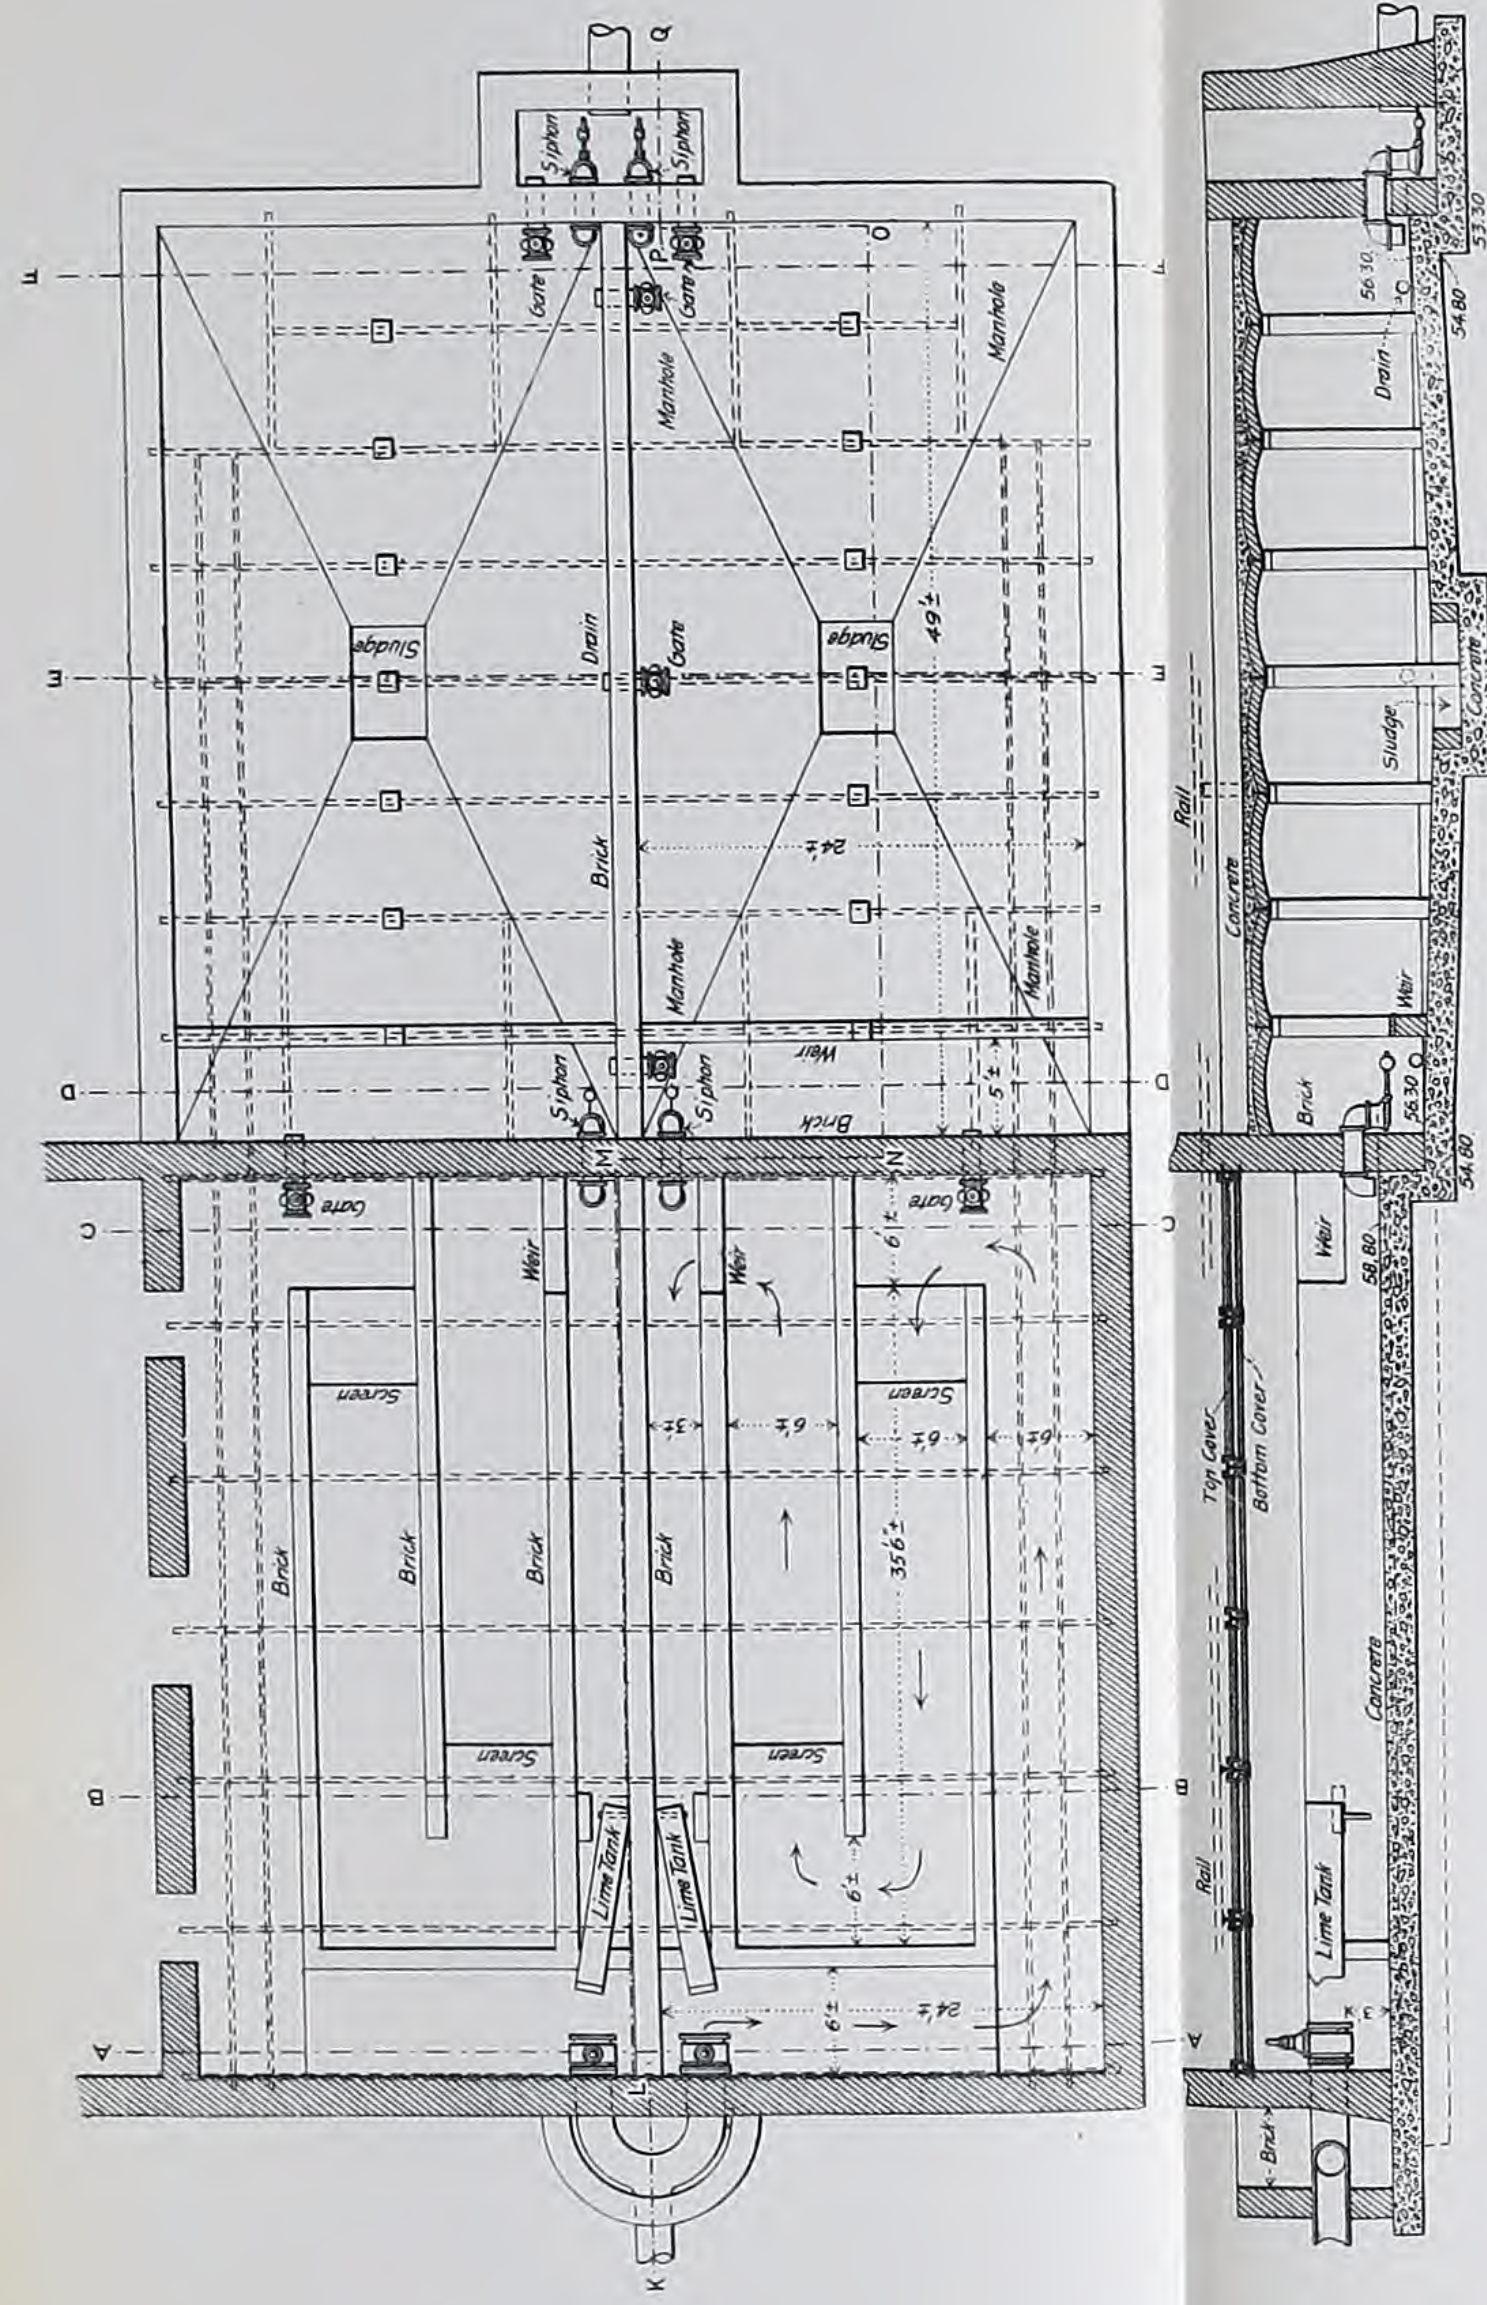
PLAN AND LONGITUDINAL SECTION OF TANKS.
